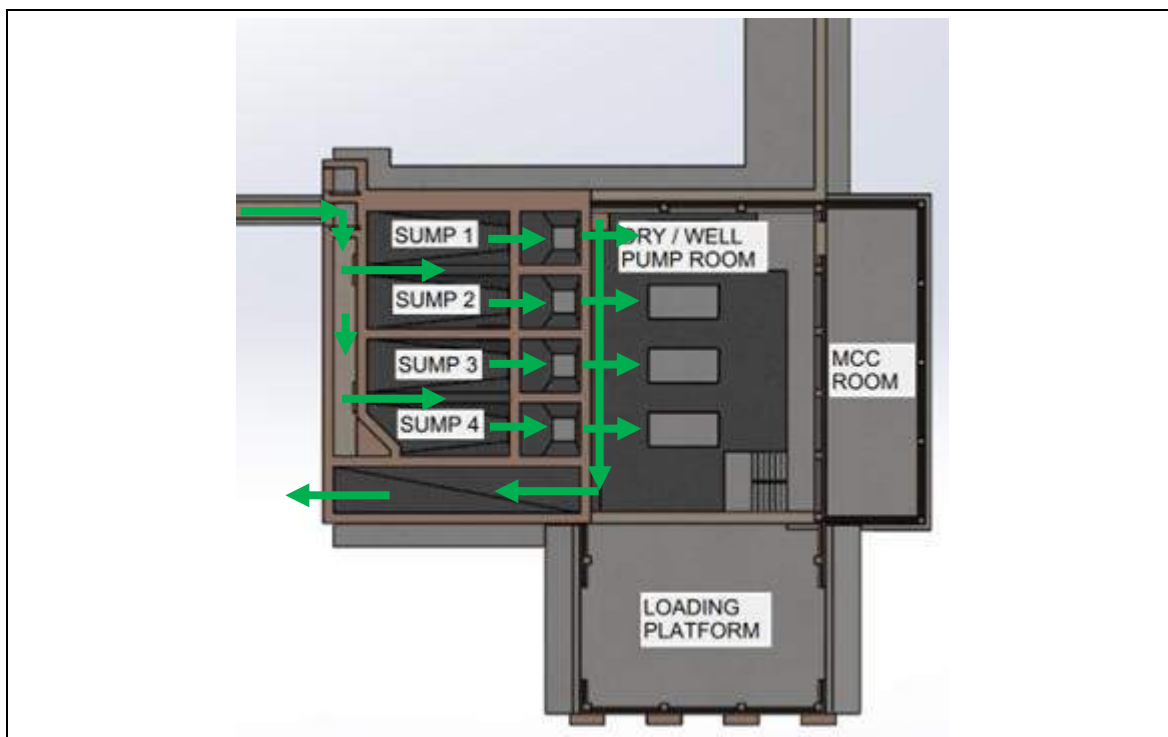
Typical Layout of a Phase of the PS Wet-well & Drywell with MCC Room & Loading Bay
